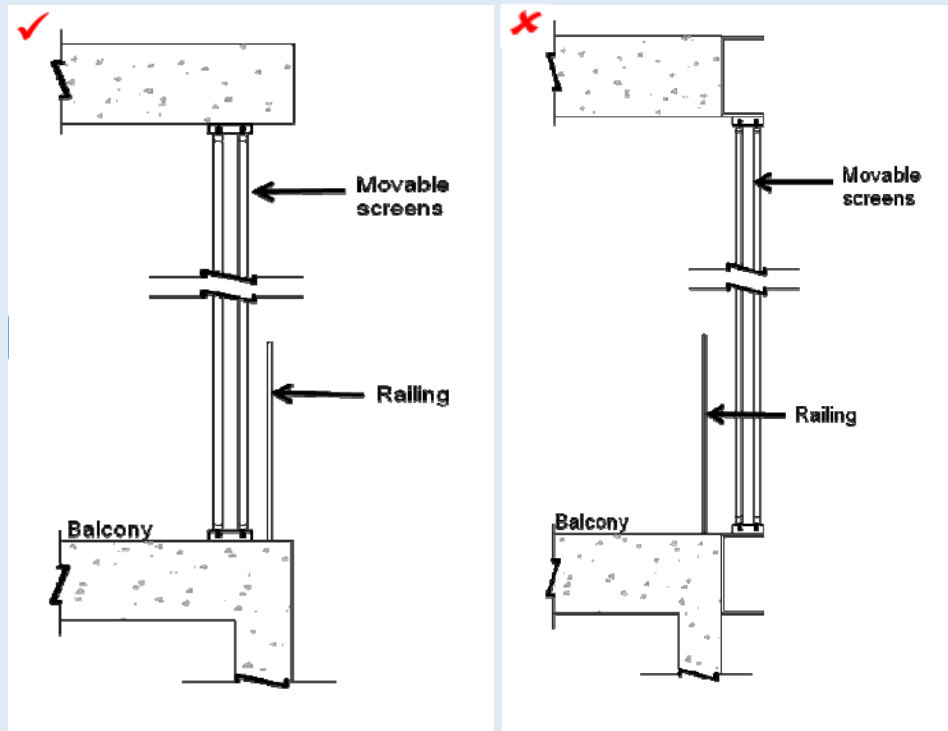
Exterior Movable Balcony Screens should be on interior of building/parapet wall
